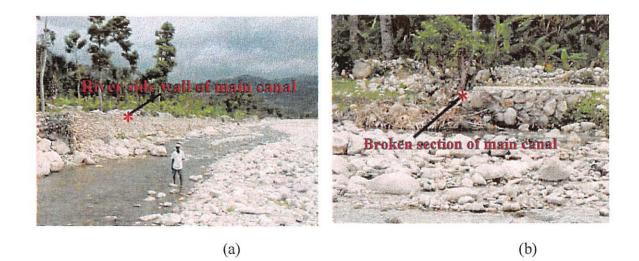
Upper section of main canal at Belle Roche below the intake structure has survived due to the rock wall structure, but the lower part of this section has been broken as shown in the right photo.
